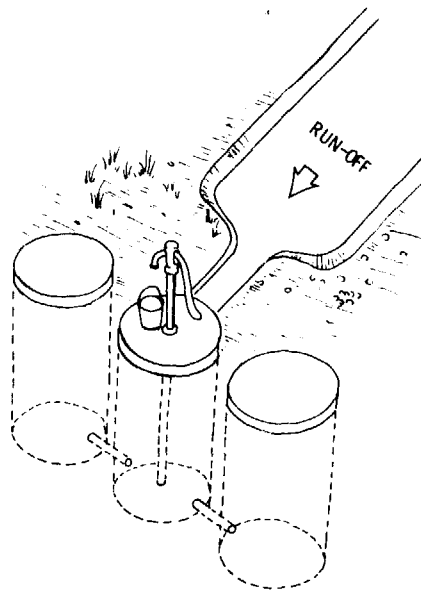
Linked cylindrical tanks for surface catchment, used with a concrete catchment surface. The tanks are excavated in the ground, lined with brick or stone, then plastered with cement to make them watertight (after a drawing by the Christian Care organization, Umtali).
